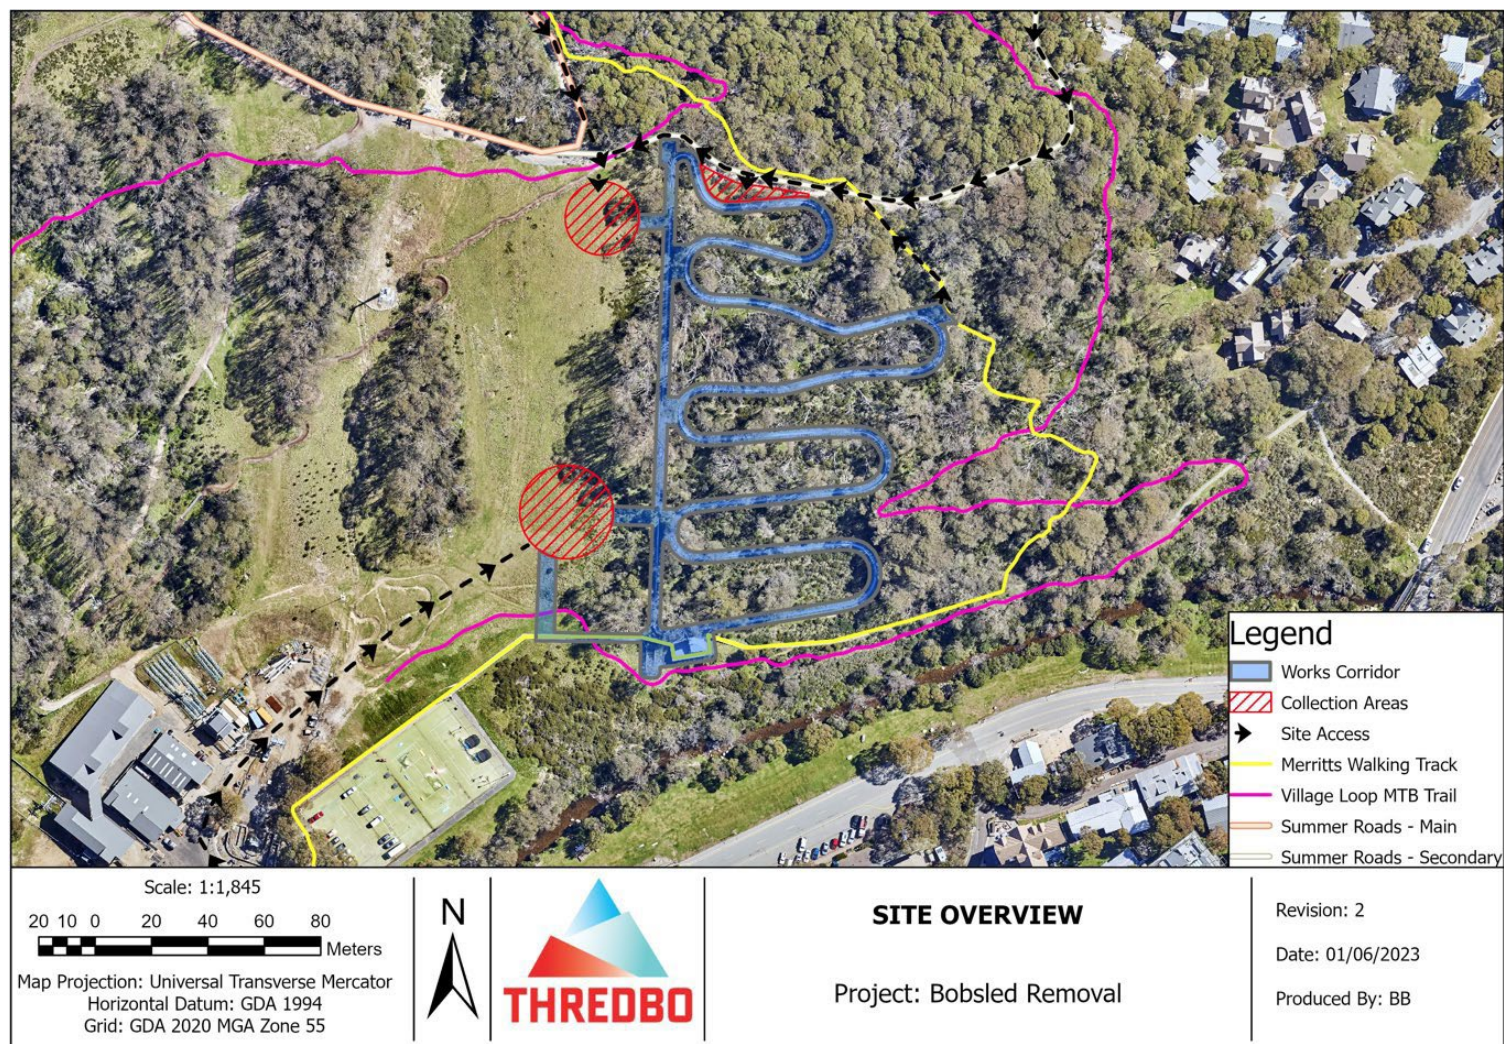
Bobsled demolition project location (Source: KT 2023)
